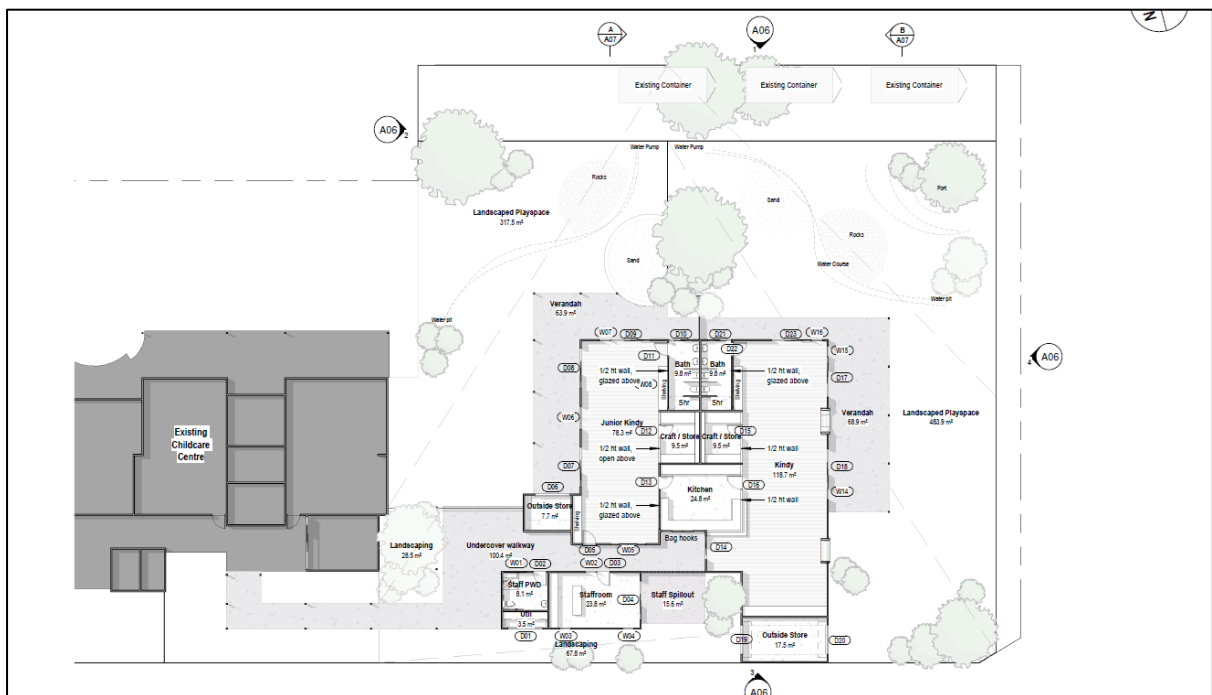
Site Plan – Proposal Plans (Source: NEArchitecture 2024)
